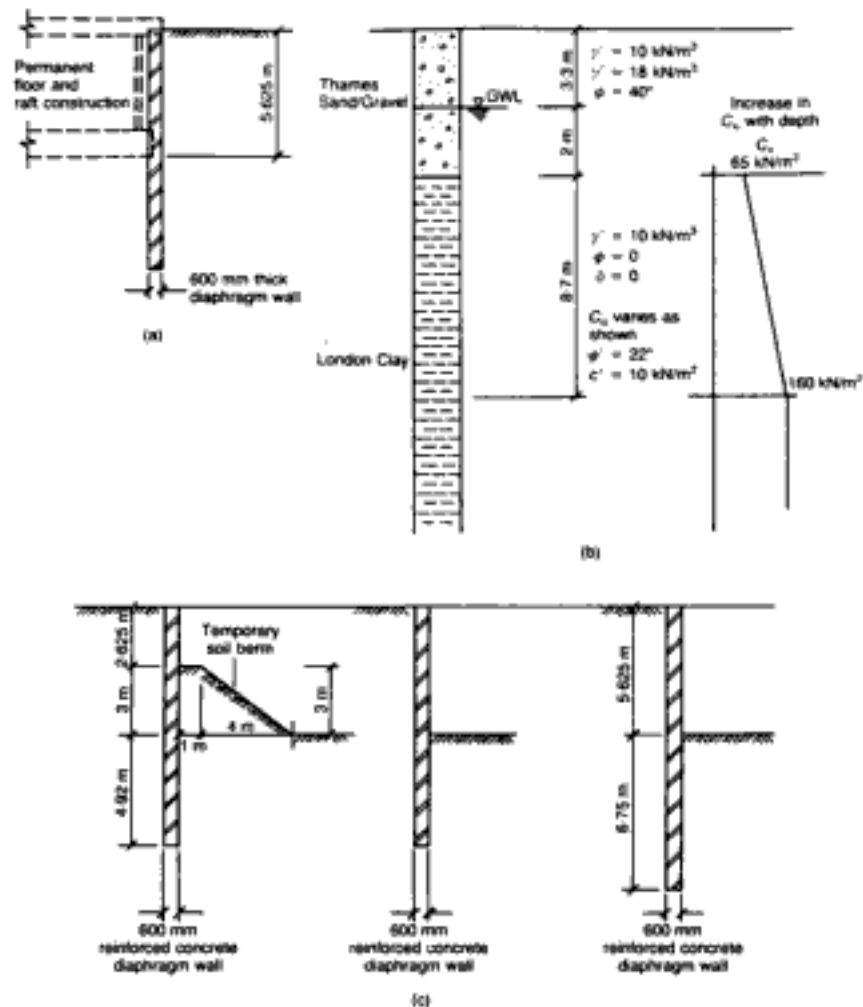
Cantilever wall, West London: (a) wall cross-section; (b) soil profile; (c) calculated maximum deformation with and without soil berm
